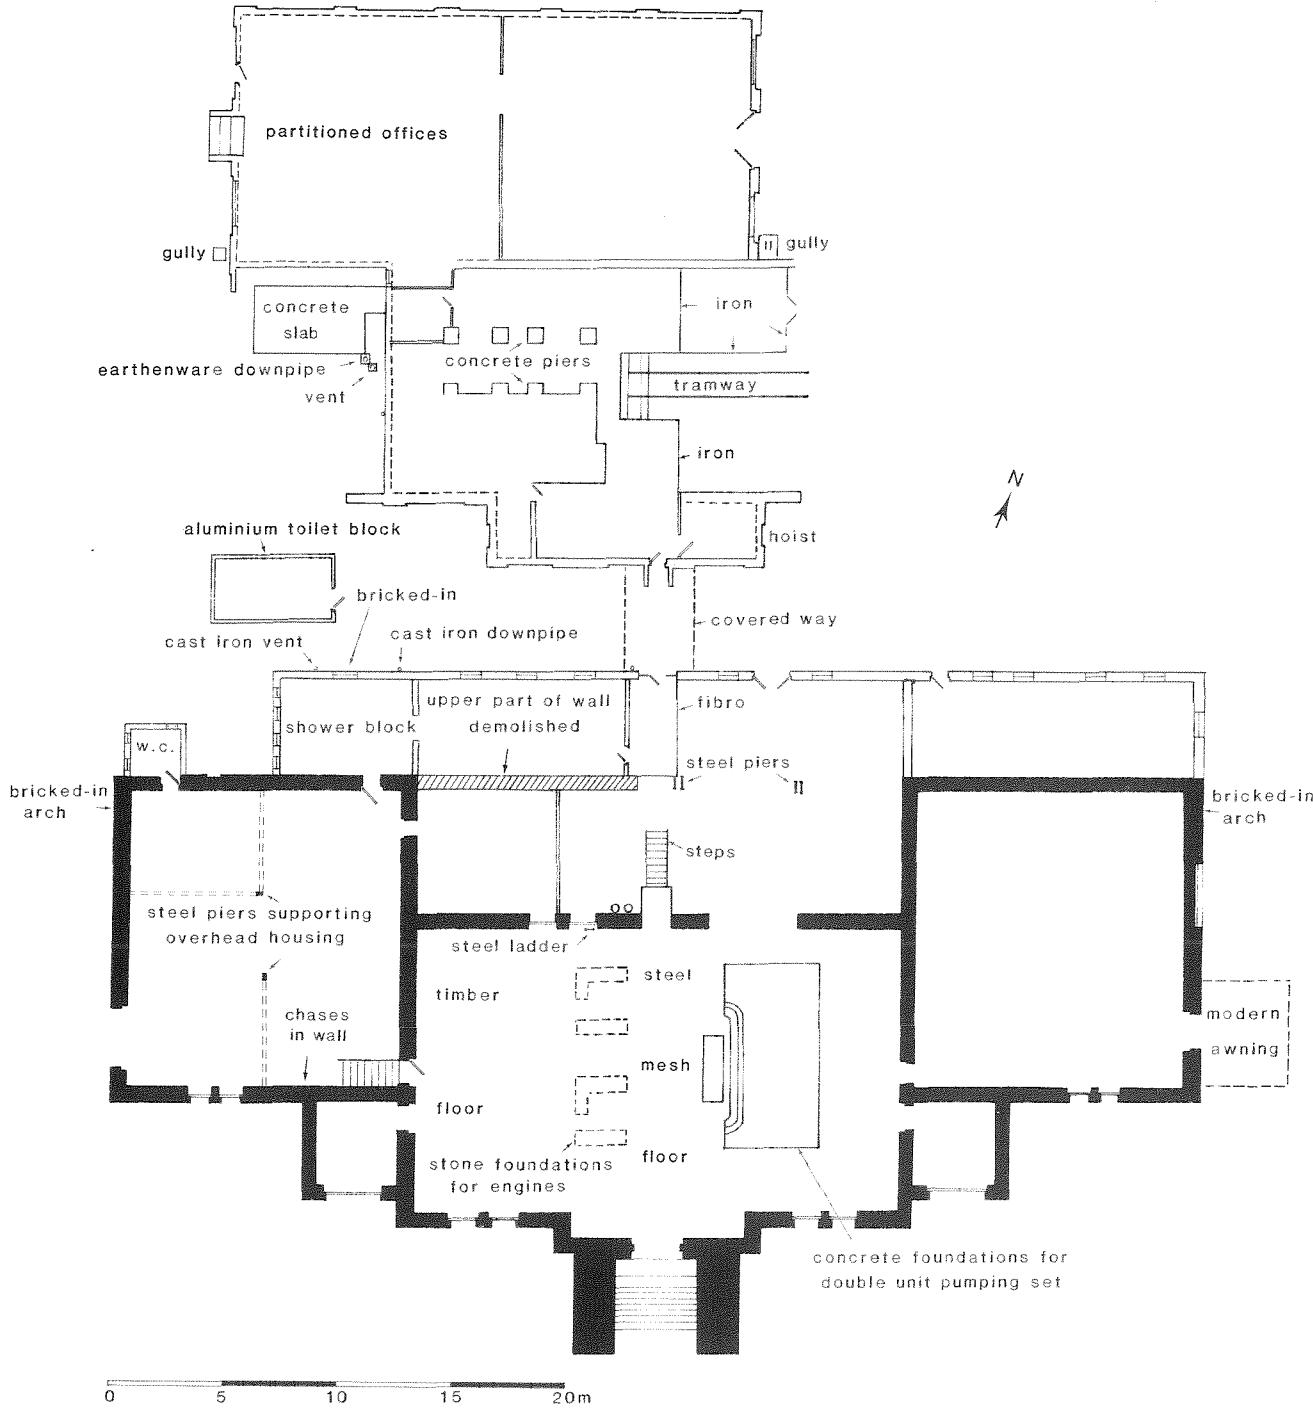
Plan of Bullock Island Hydraulic Power-House. 1979.
